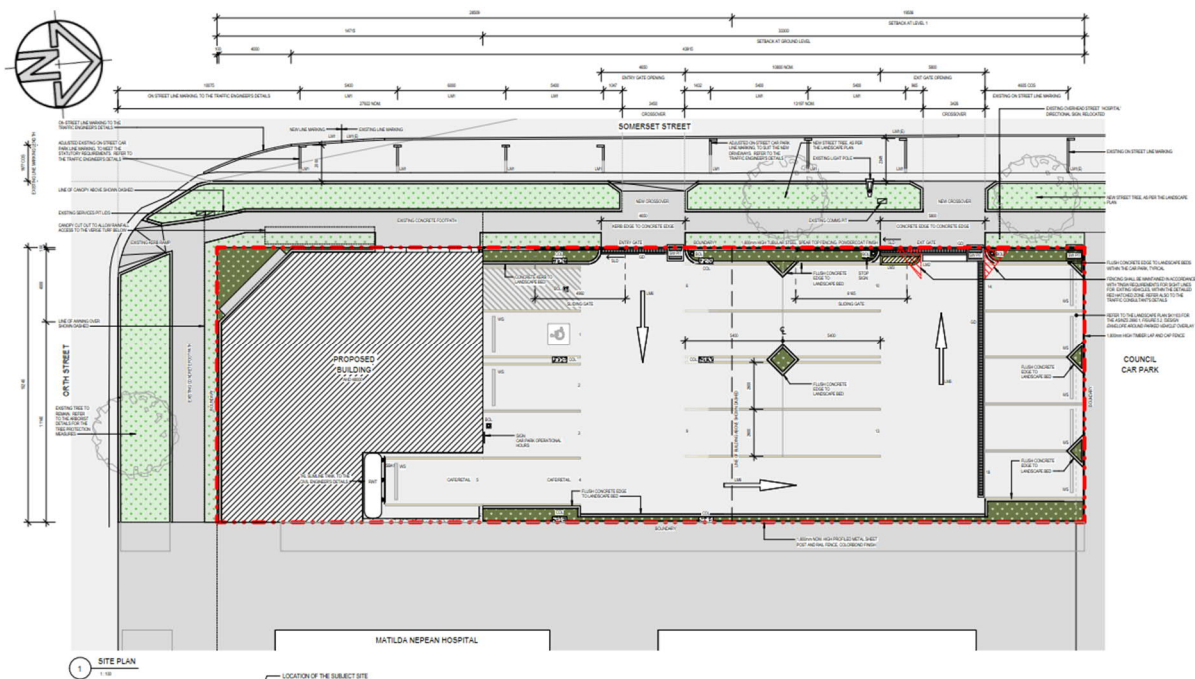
Proposed Architectural Layout (BELL Architecture)
